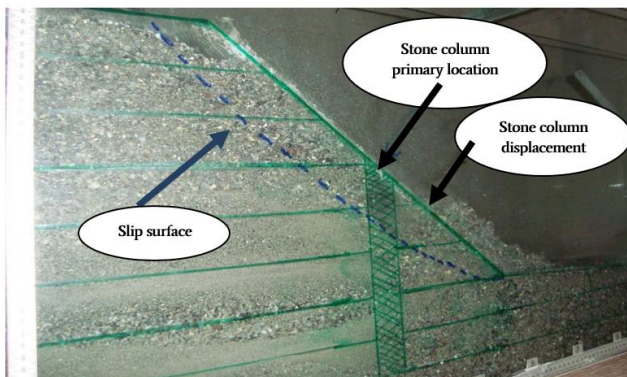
Failure of the reinforced slope using an ordinary stone column under a pressure of 6.06 kPa.
